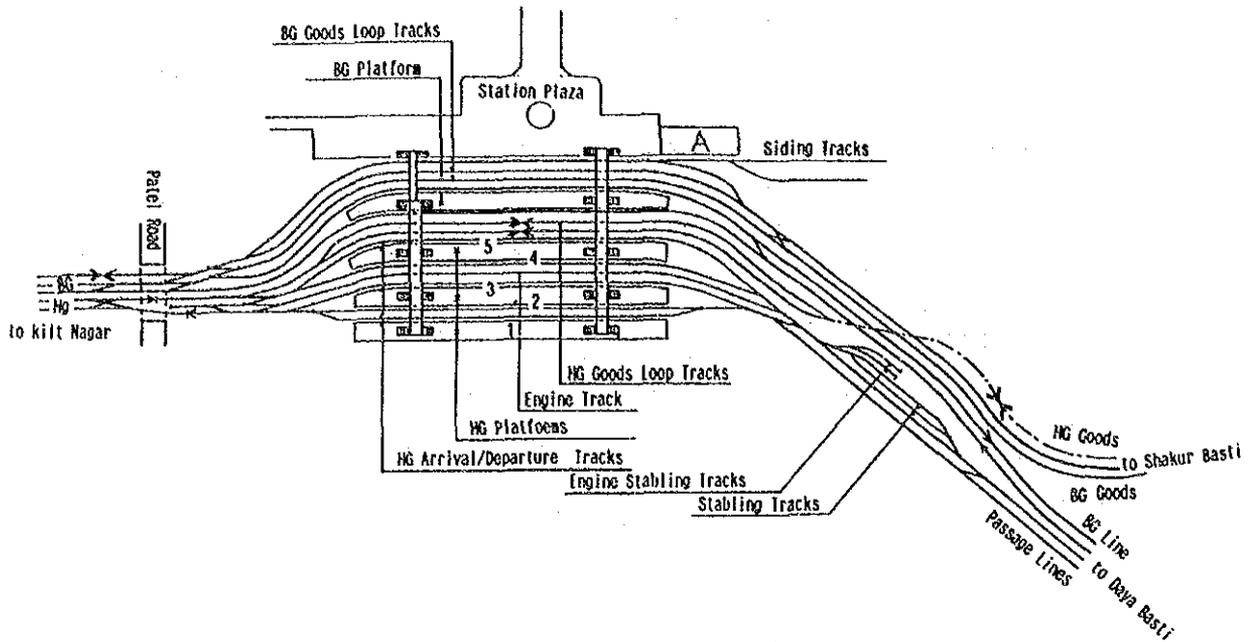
Conceptual Plan of Patel Nagar Terminal Track Layout
